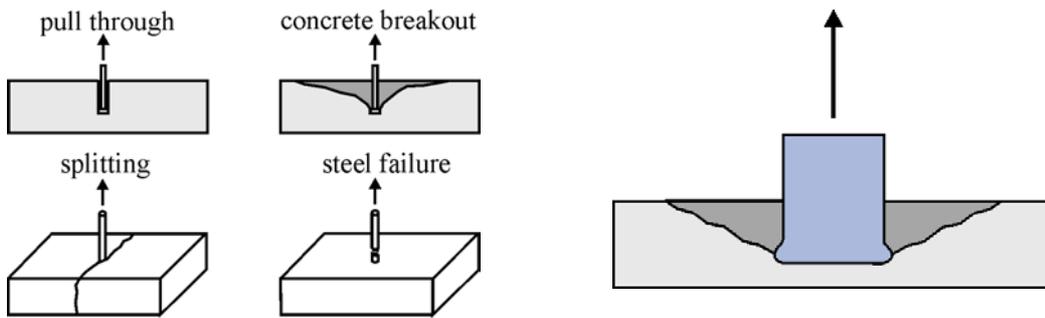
Types of failure (left) and concrete breakout of a puzzle tooth (right)
